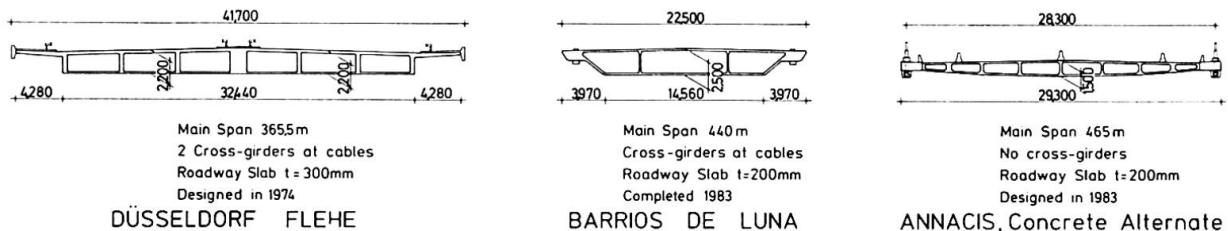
Cross-sections of long-span cable-stayed concrete bridge beams
